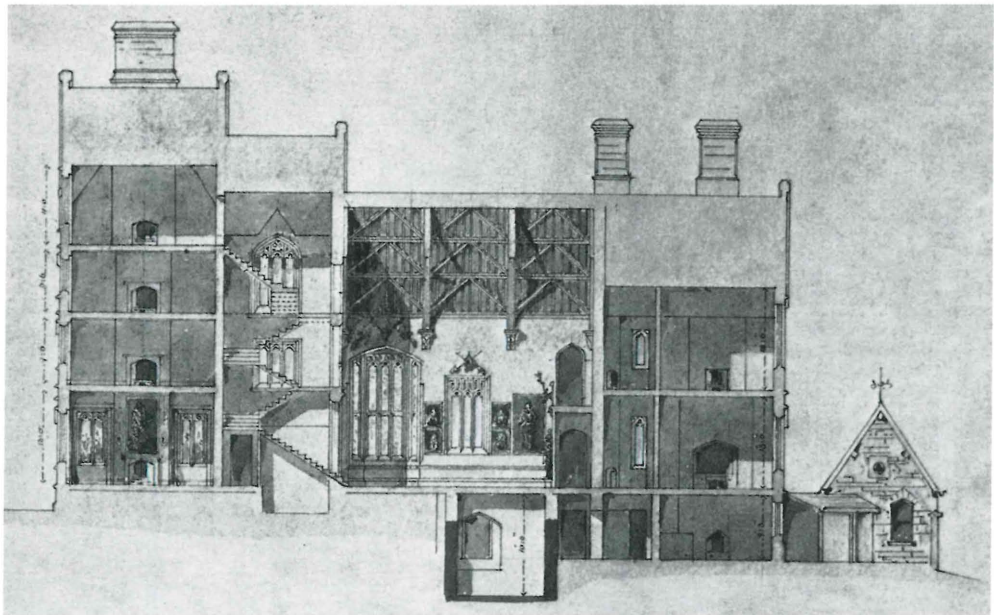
Wyatt's sectional drawing showing interior arrangement of The Ham.
